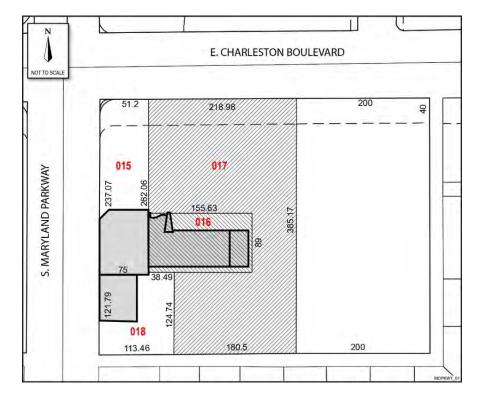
Huntridge Theater Building and Original Parking Lot
